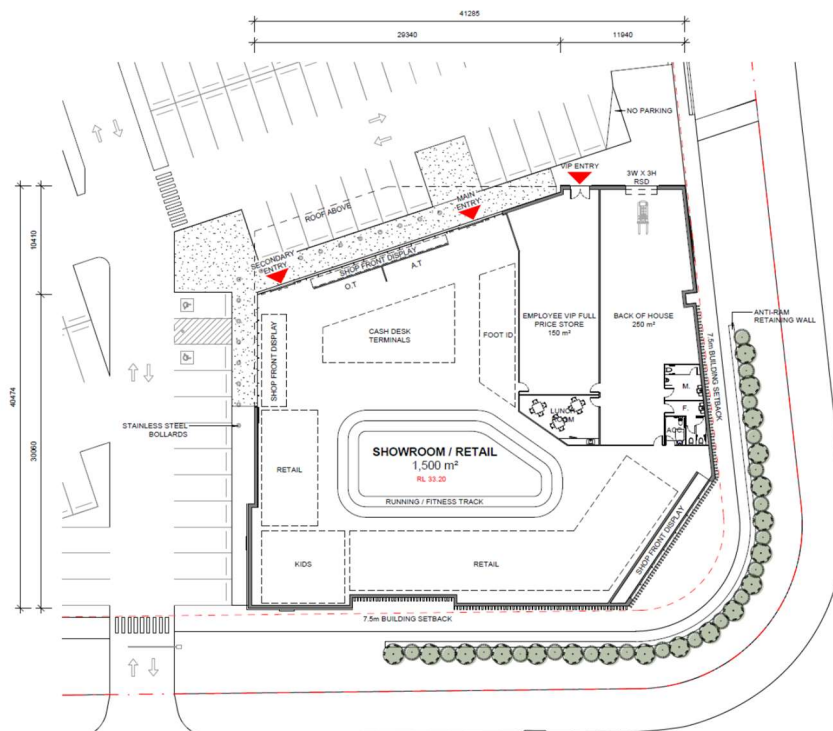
Floor Plan – Showroom and Retail Outlet (Source: Reid Campbell)
